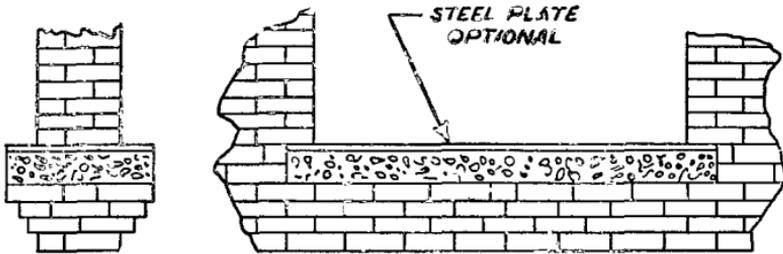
Concrete sill supported by a corbel of brick used with combustible floors.
